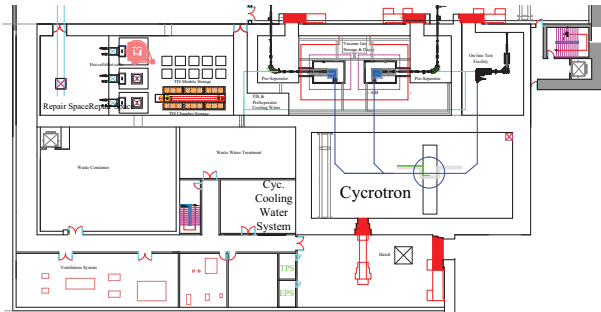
The basement floor plan of ISOL building. The cyclotron vault, the water cooling system room, and the ISOL bunkers are located on this level.
